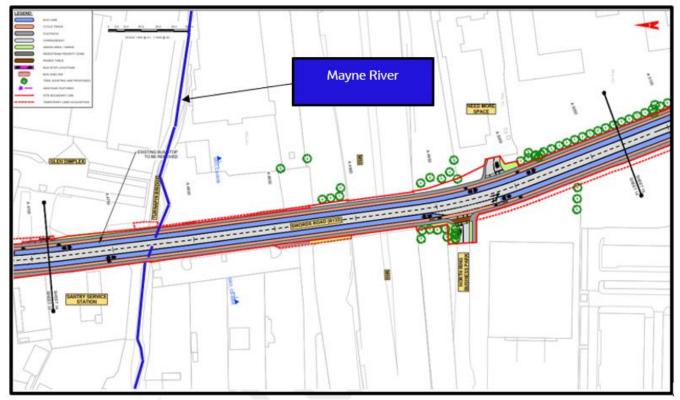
Proposed works around the crossing with Mayne River on R132 (around Ch. A04 + 775)
